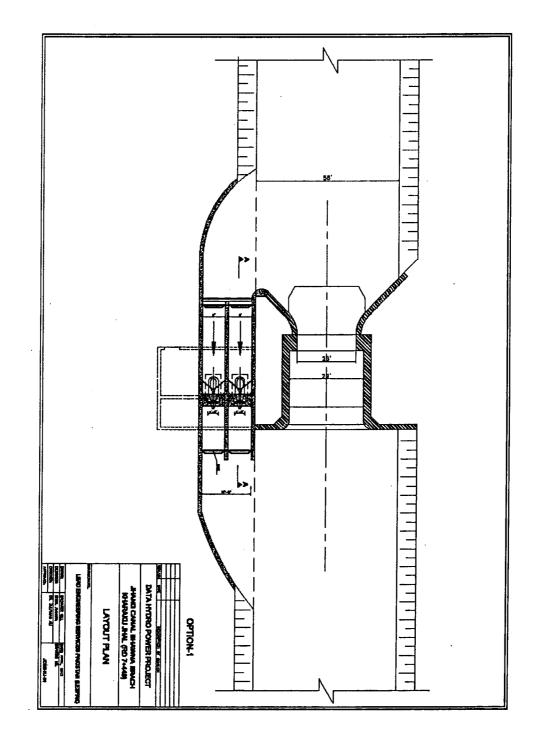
Fall at RD 7+449 (Option-1, Layout Plan)
